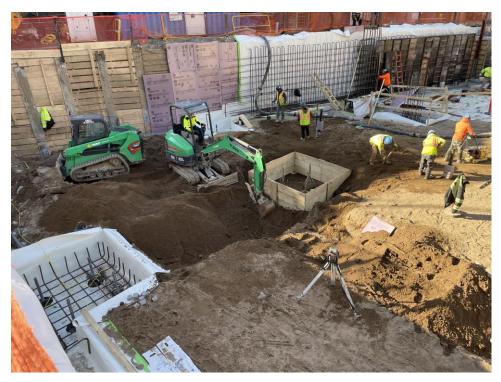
ECD excavating around a pile cap in WCG COMP A (facing west).
